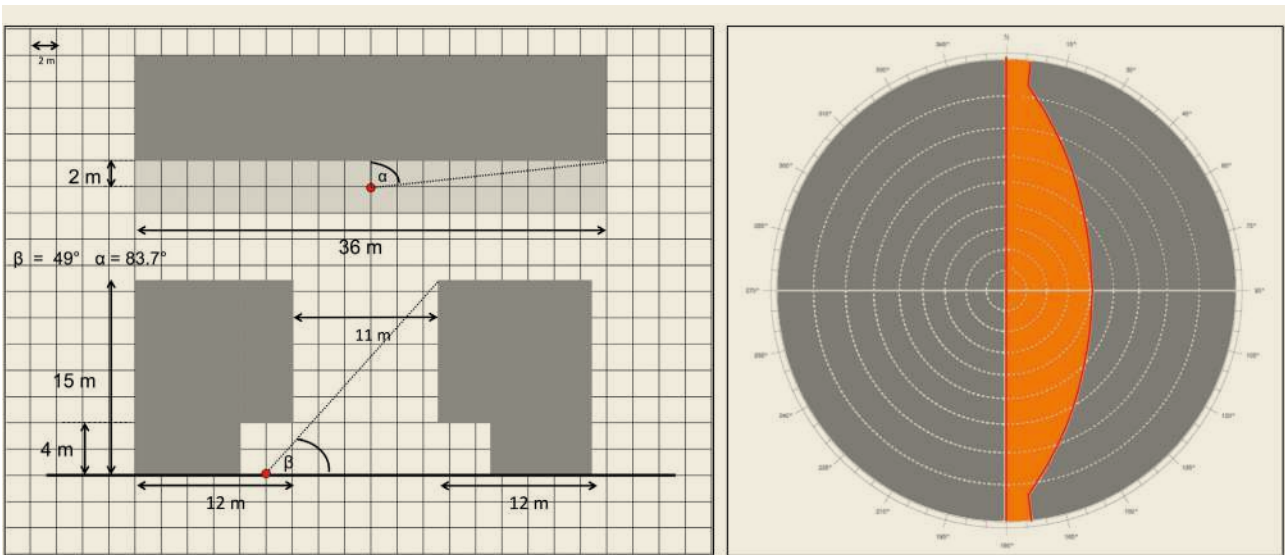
ARCADE FRONT VIEW AND SECTION (LEFT); OBSTRUCTION PROFILE FROM THE SELECTED POINT (RIGHT).
